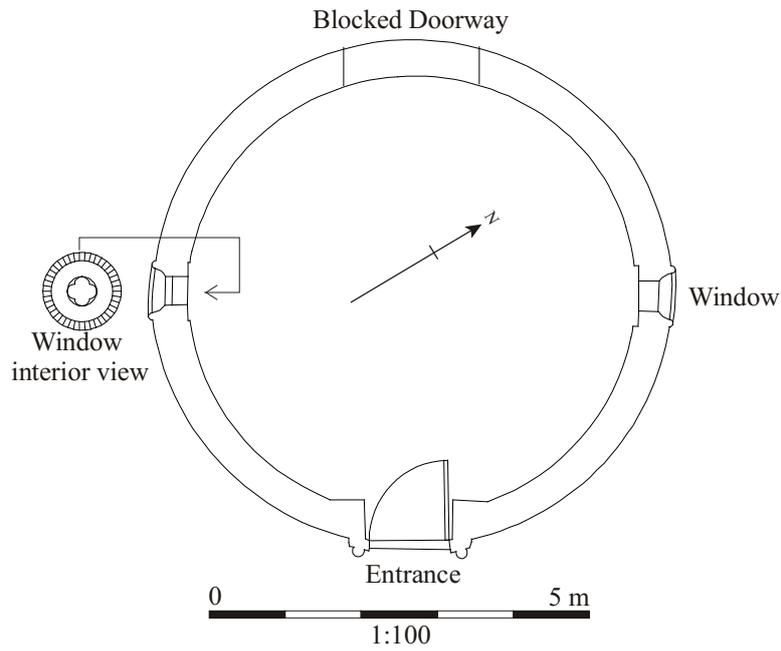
Plan Showing Location of Doorways and Windows, with Interior Detail of Window
